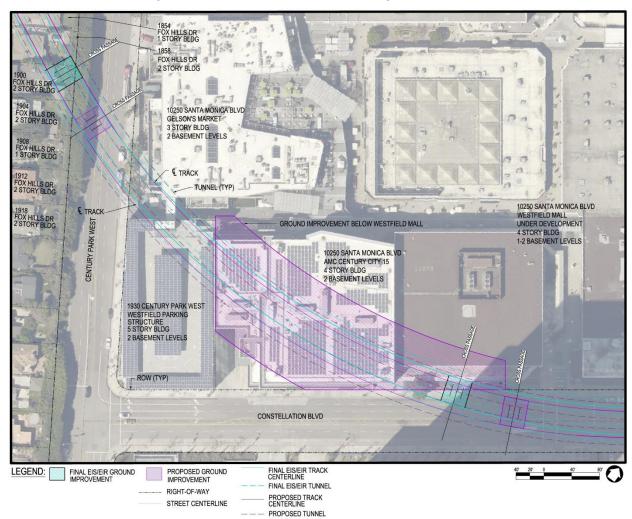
Ground Improvement Grouting at Westfield Mall
